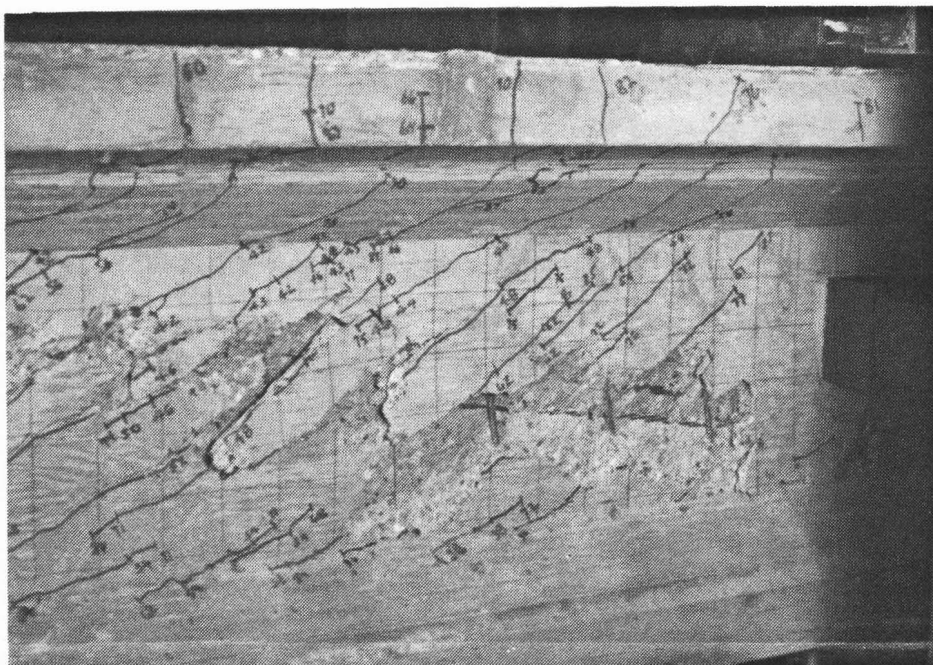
Crack pattern for specimen 1B-8-D at failure.
